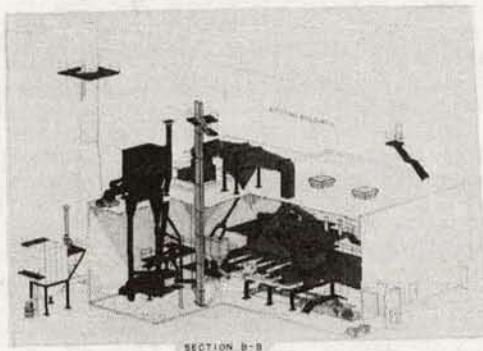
GREAT LAKES AFB EQUIPMENT LAYOUT
